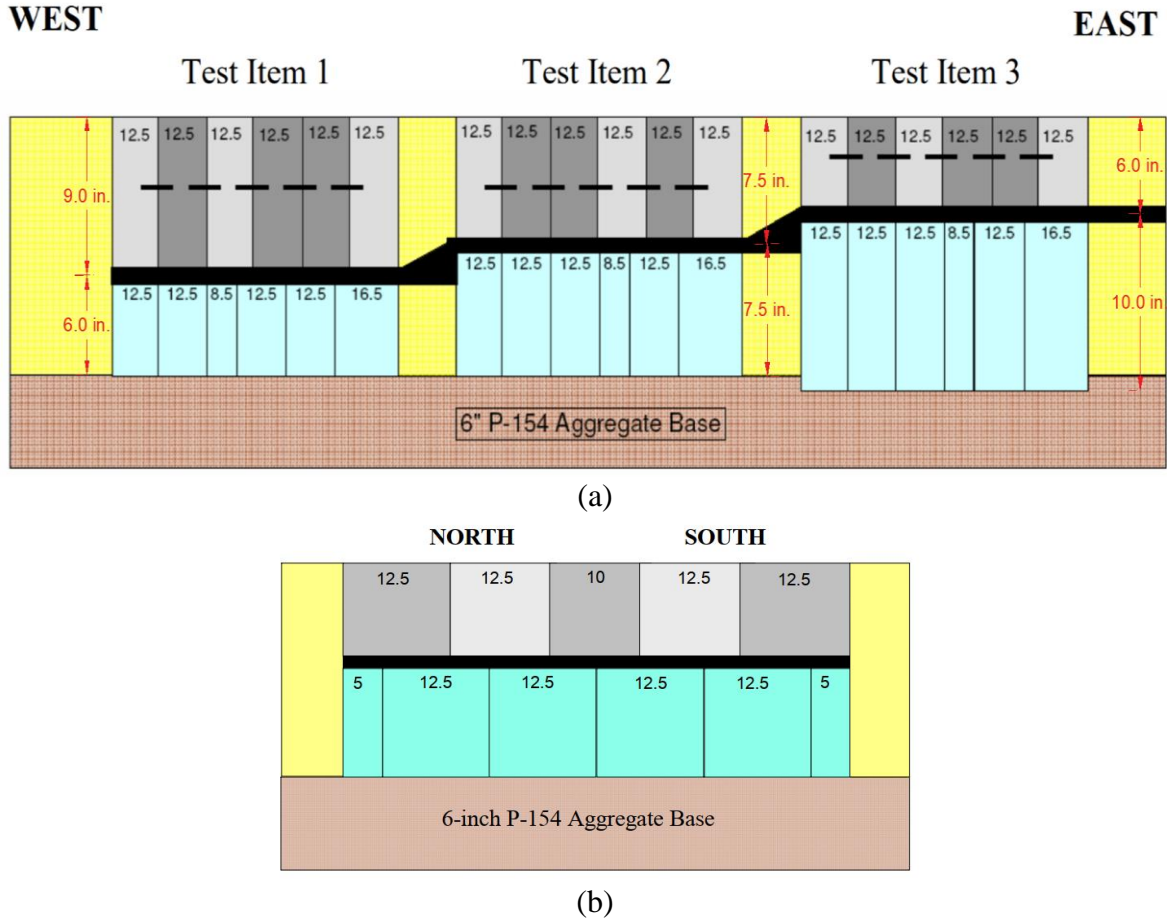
Layout of CC-4 Test Items at NAPTF (a) Longitudinal Cross-Section Showing Transverse Joints (b) Transverse Cross-Section Showing Longitudinal Joints (Stoffels et al. 2008)
